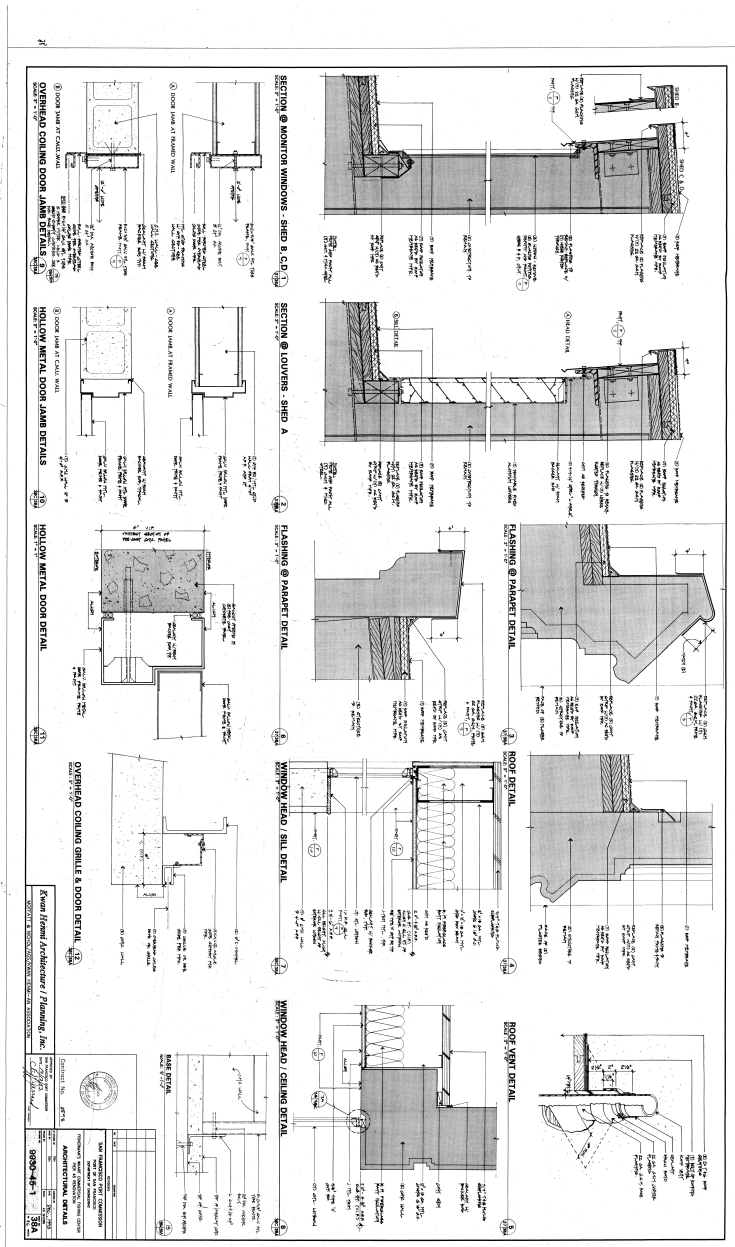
Typical monitor window, louvers, parapet, ceiling, and coiling door details.
